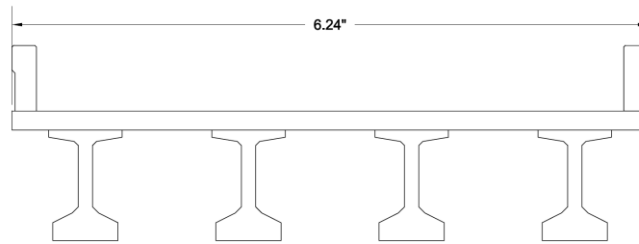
Bridge Model 2: 26’ wide deck with four TX-54 girders
